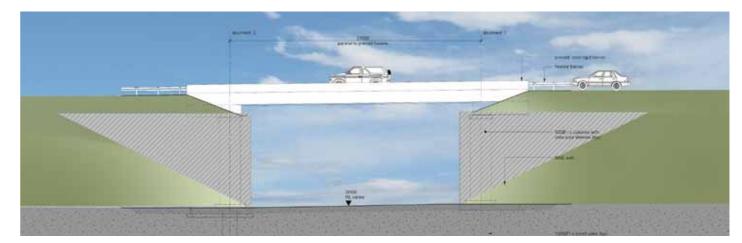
Bridges 13 & 14: SH58 Interchange west elevation
